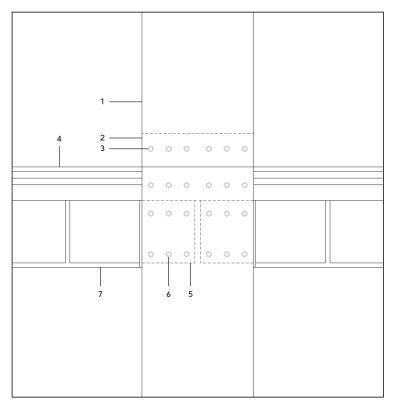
Construction detail of exterior frames and their connection to the structure.
